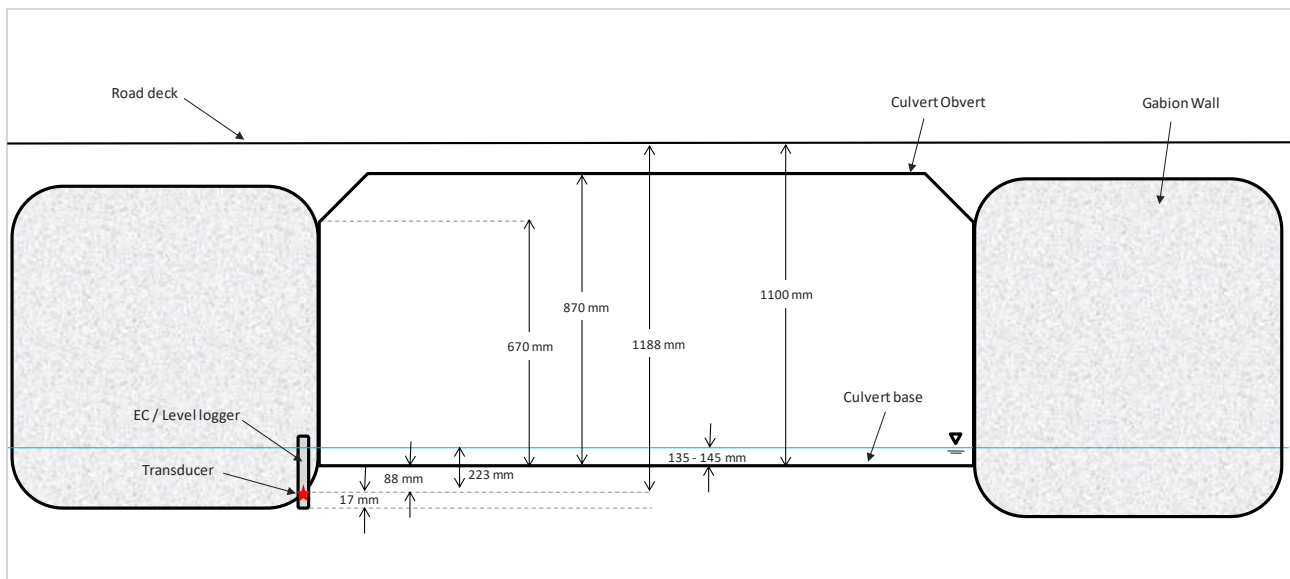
Schematic with measured dimensions for the culvert at Site 11
